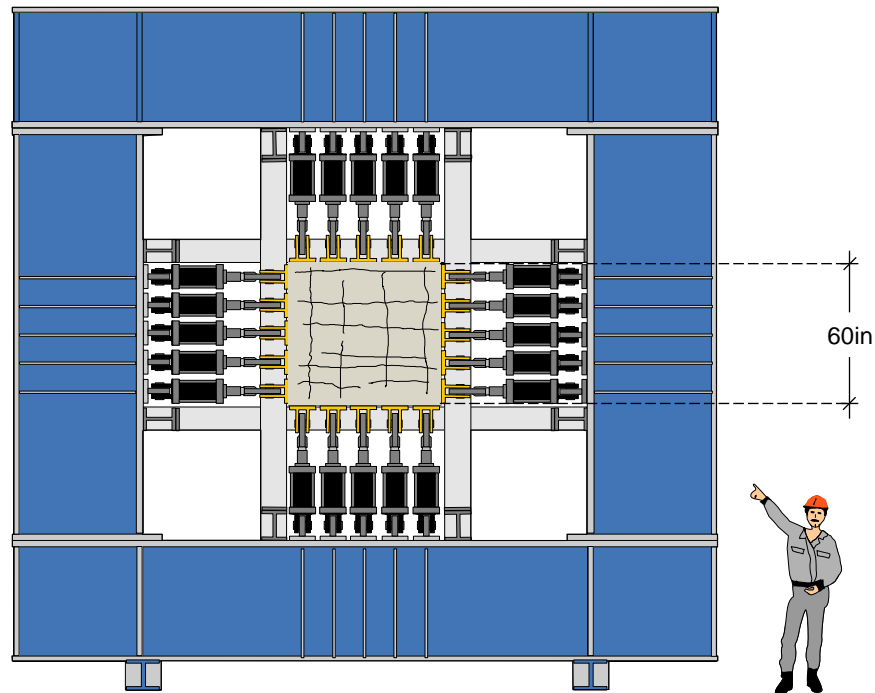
The shell element tester apparatus, used for the shear testing of the reinforced concrete panels
